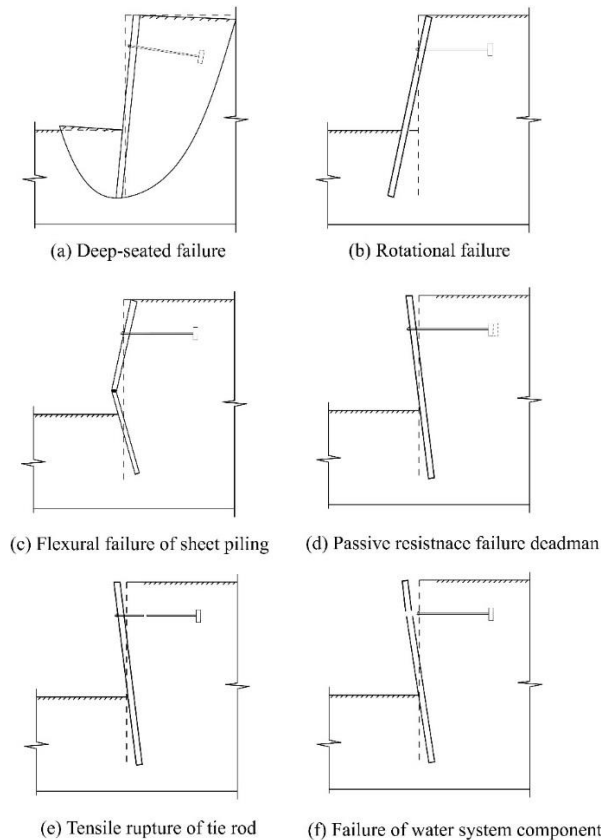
Failure types of laterally loaded sheet pile retaining walls (U.S. Army Corps of Engineers, 1994)
